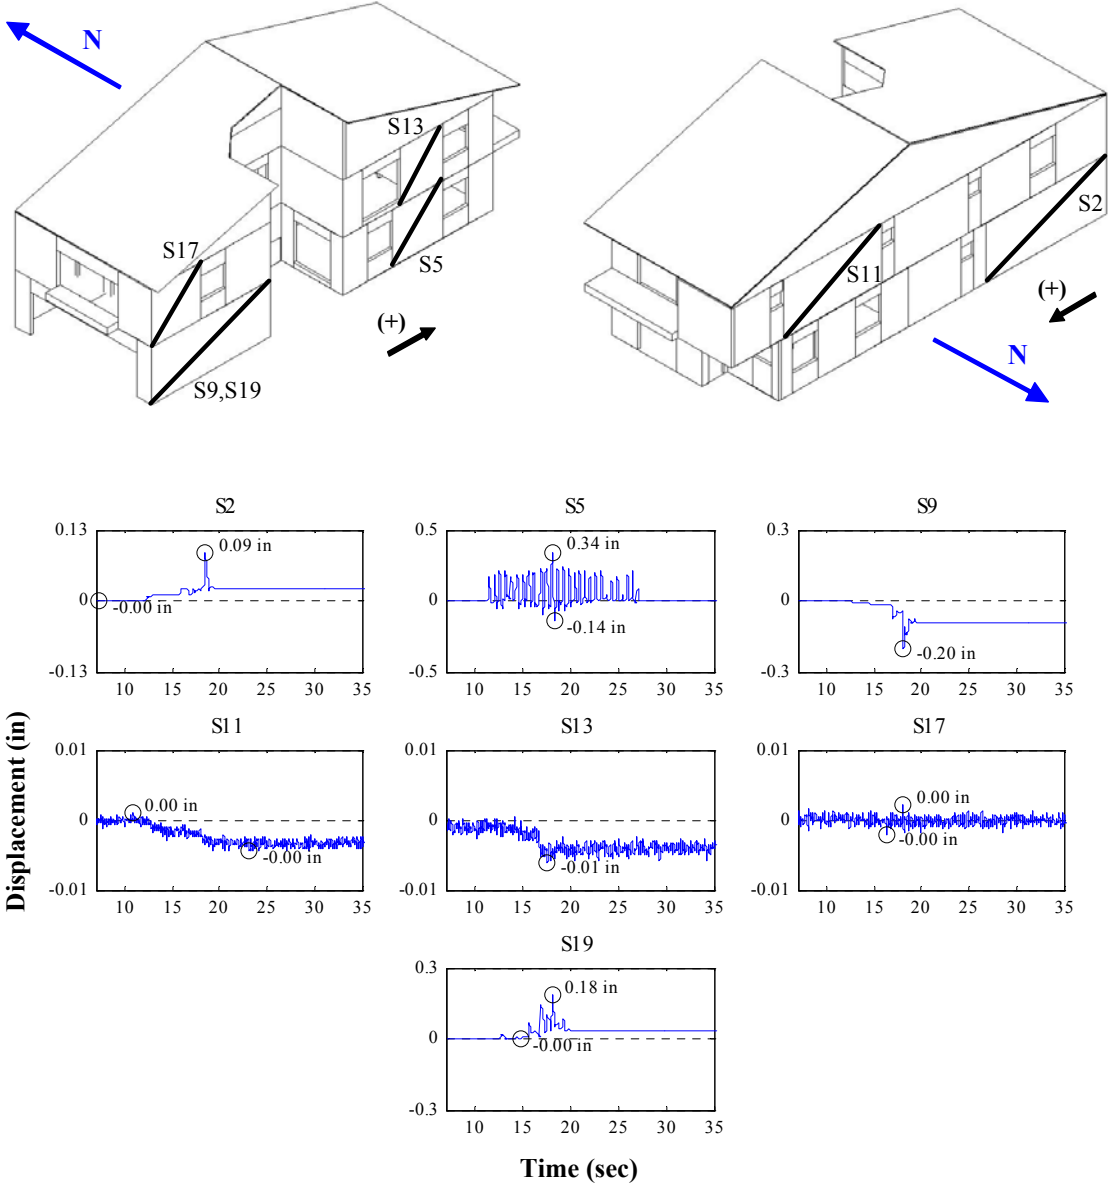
Wall deformations of east-west external walls for Test NWP5S07
